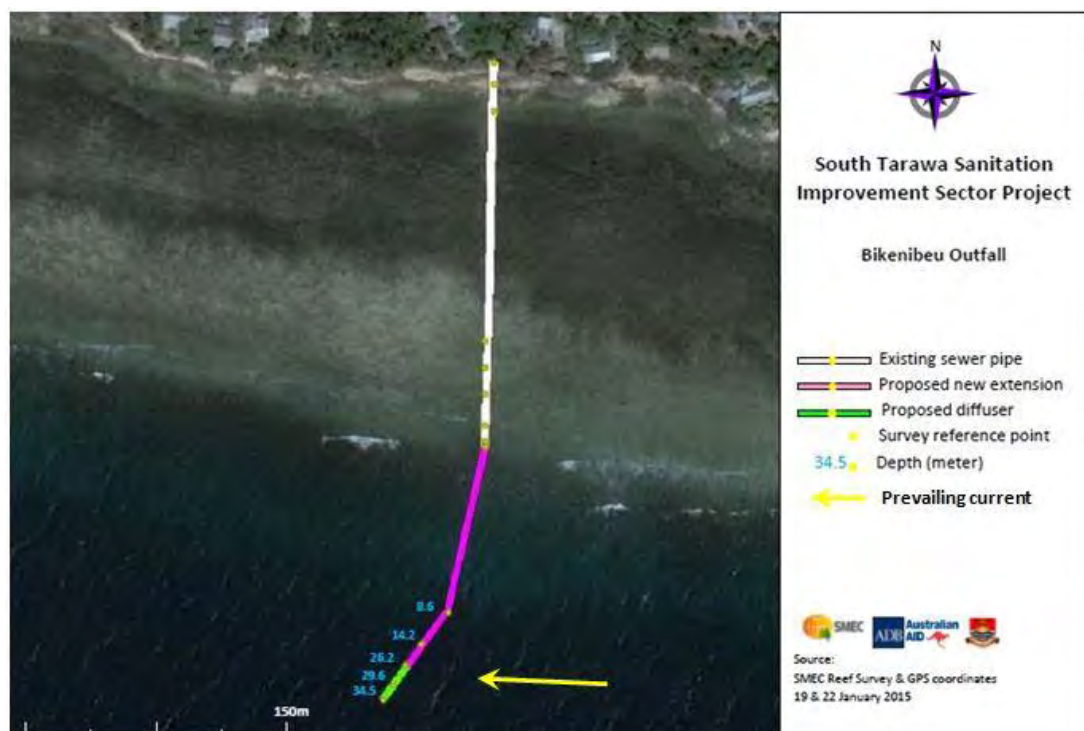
Existing Outfall Pipe and Proposed Extension at Bikenibeu (note: reference depths not corrected for 0 datum)
